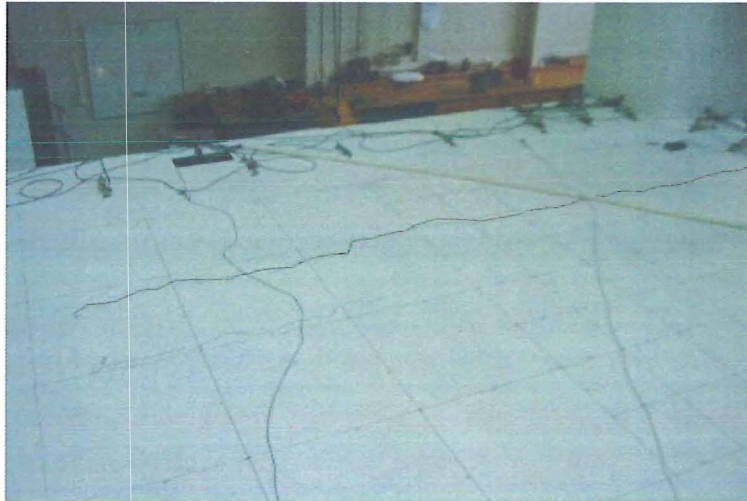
The topping crack that formed perpendicular to the direction of loading (SE Corner)
